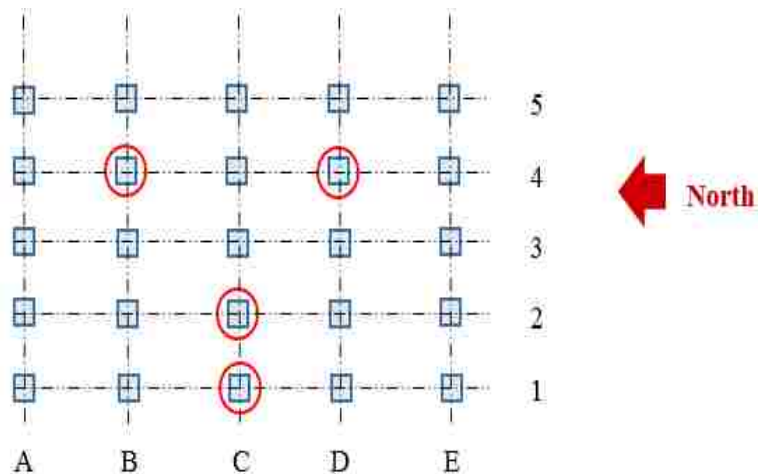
Piles Distributed Plan and Locations of Tested Piles of Bridge #1676
